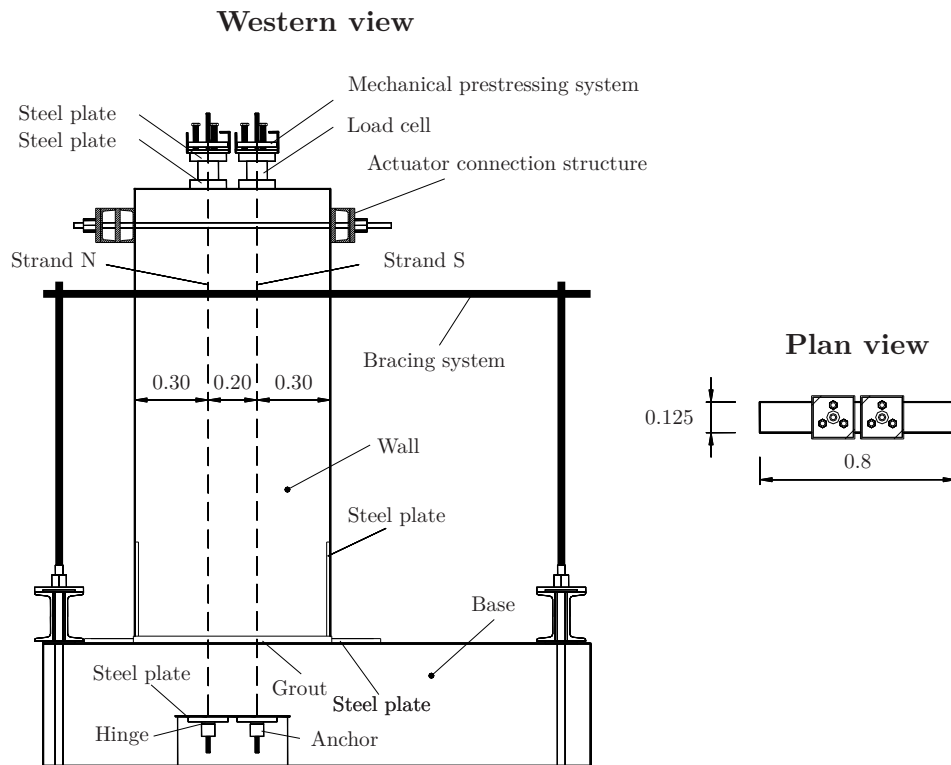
Western and plan views of wall specimen RM6 test setup.
